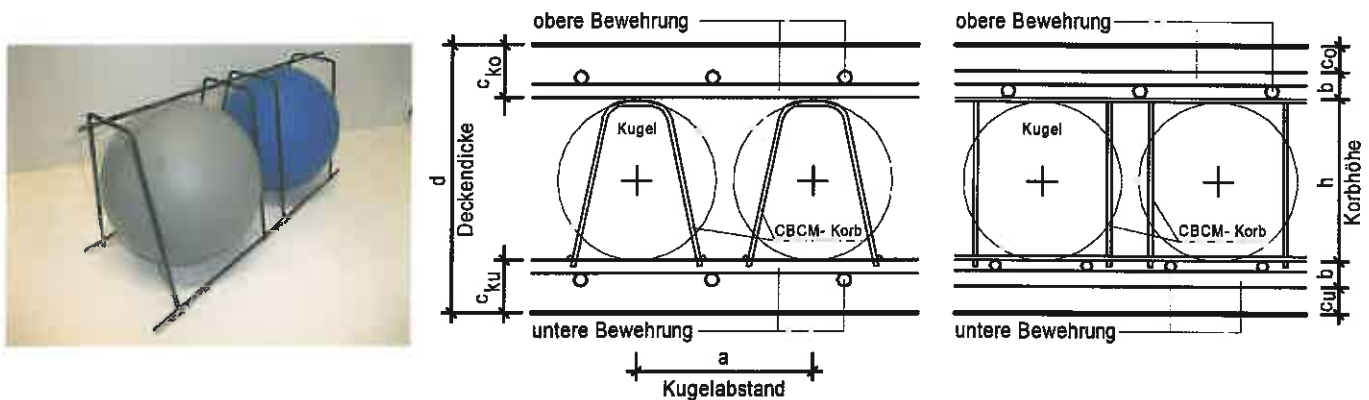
Cobiax cage module detail, cross-section and longitudinal section of a multiaxially stressed cast-in-place Cobiax floor
